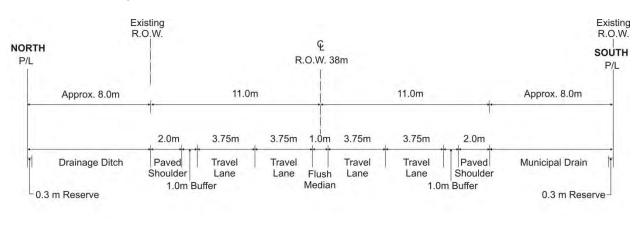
TYPICAL CROSS-SECTION COUNTY ROAD 42 20+500 (JUST EAST OF COUNTY ROAD 21 (ELMSTEAD ROAD)) TO W. PUCE RIVER ROAD
